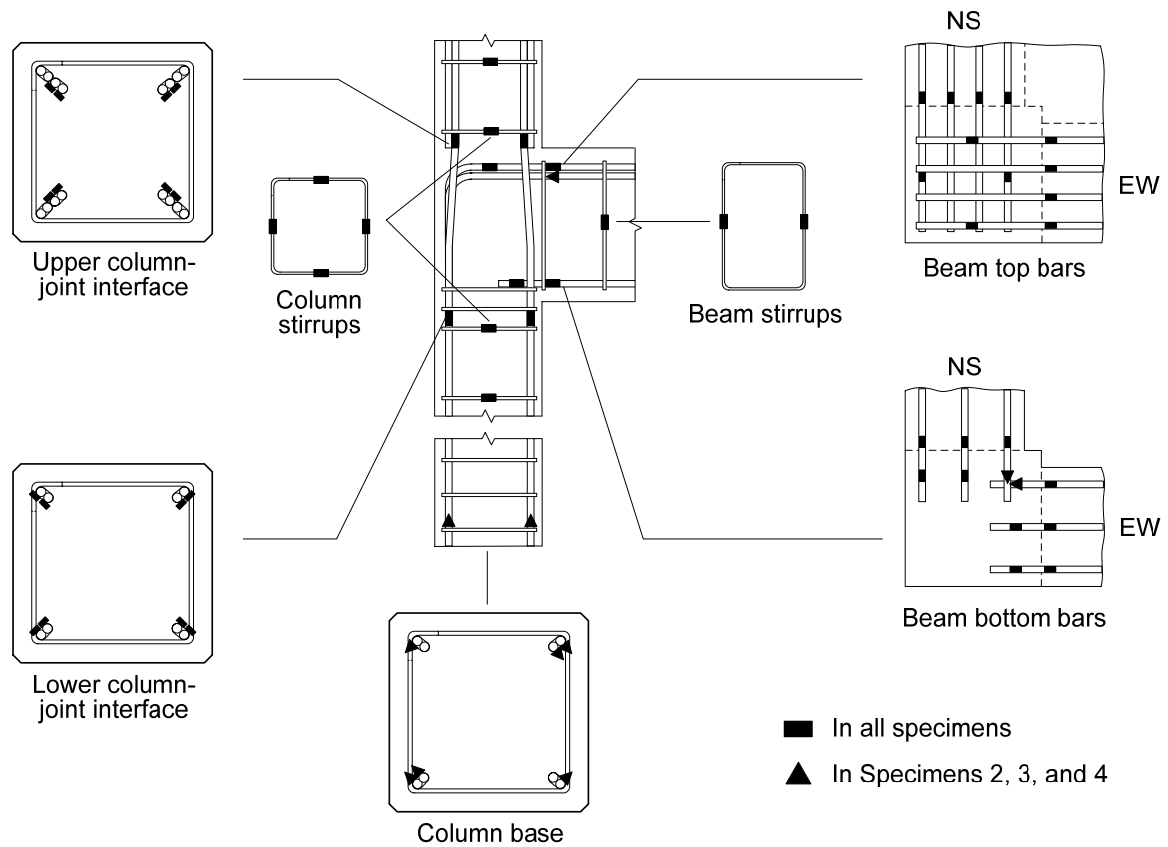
Strain gages mounted on the beam and column reinforcing bars.
